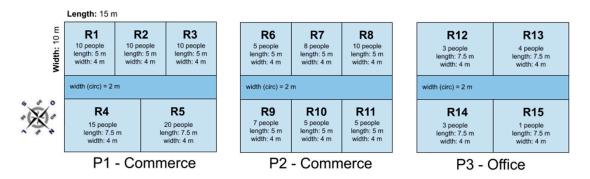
Model building rooms and floors layout, with number of users per room and dimensions.
